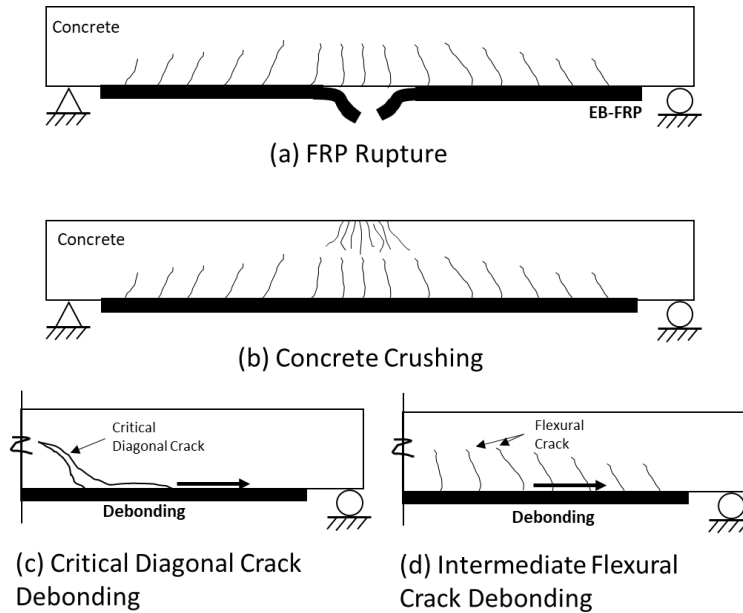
Failure modes of EB FRP Strengthened RC Beams in Flexure.
